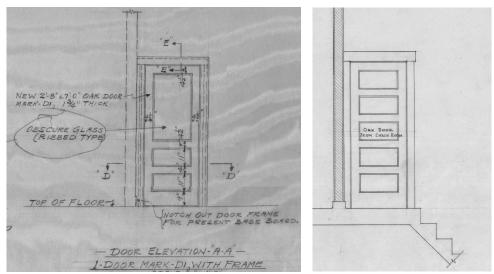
Door details from 1940 (left) and 1944 (right) remodelings.
